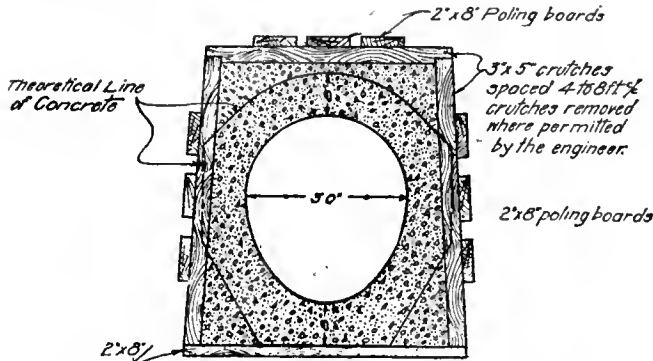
Method of timbering for 30, 33 and 36-in. ovoid concrete sewers laid in tunnel.
